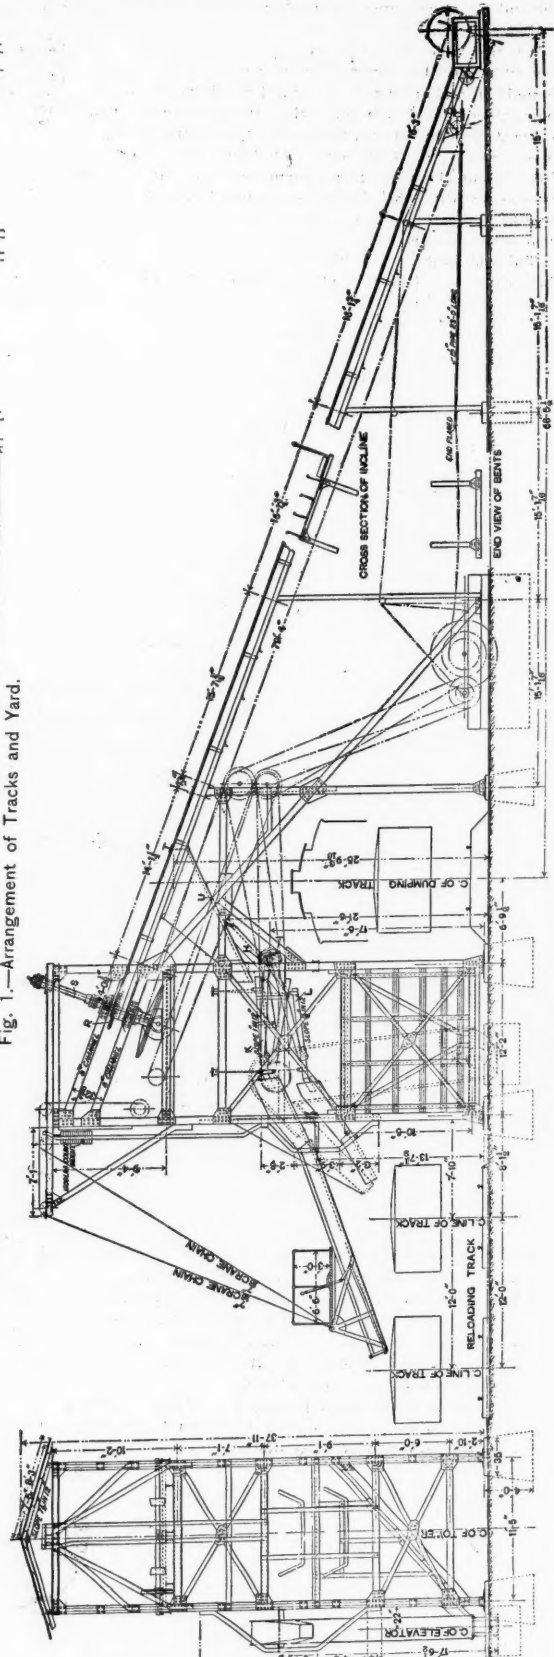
General Arrangement of Reloading Tower and Conveyor.
